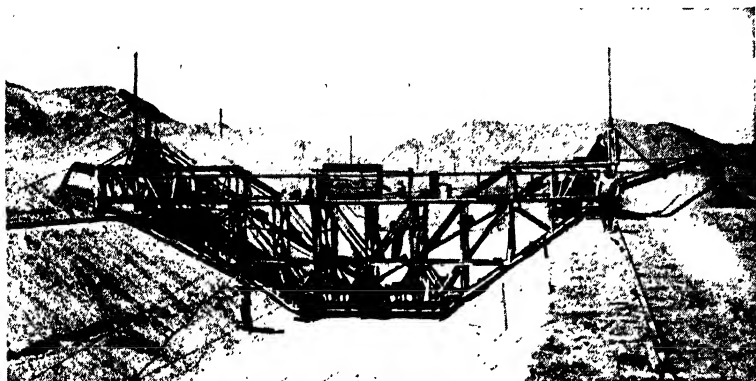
Trimming machine for finish cut on Colorado Aqueduct canal.
